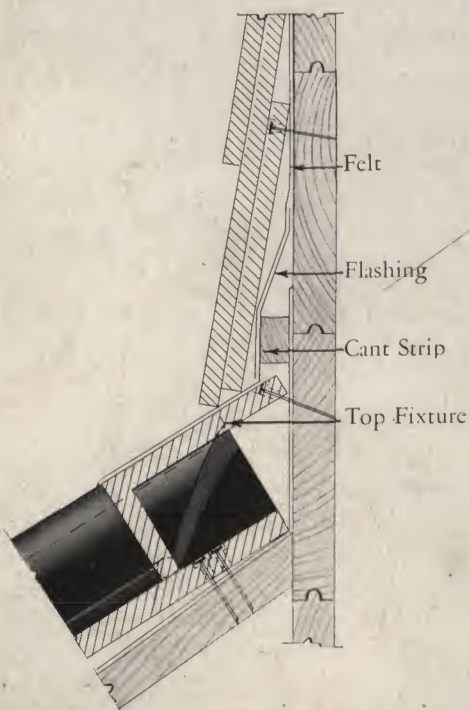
DETAILS OF "IMPERIAL" SPANISH TILE AND FITTINGS
